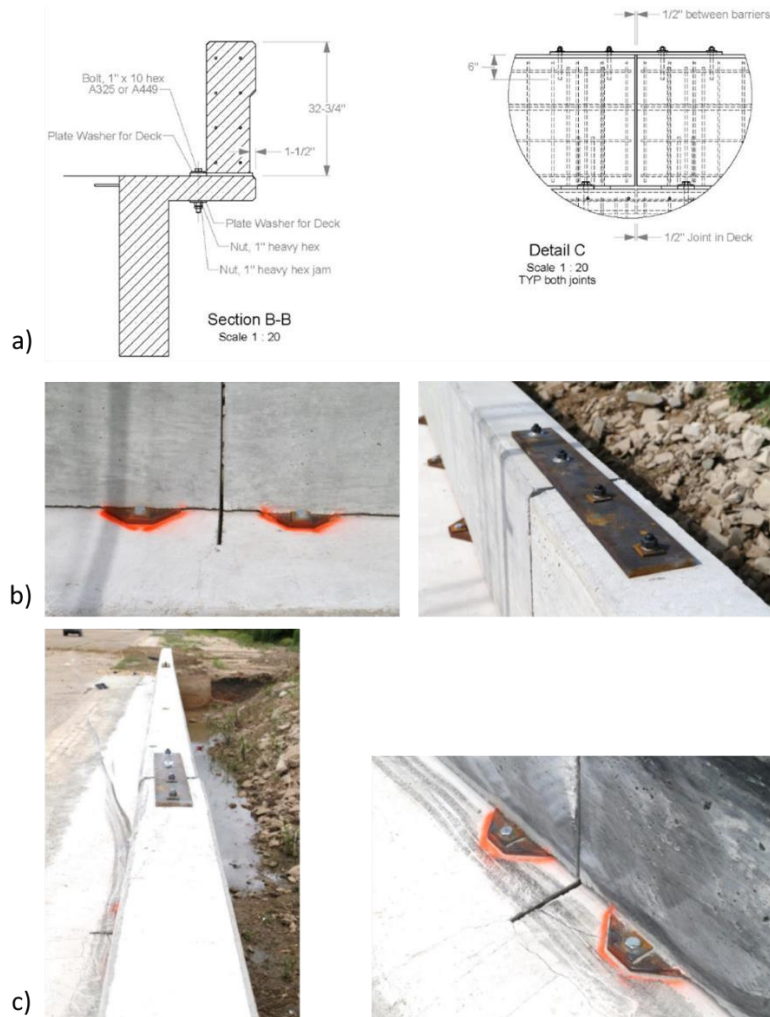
Research at TTI on the TxDOT T222 bridge rail: a) Details of the bridge rail, b) Close view of the constructed specimen at impact point, and c) damage in the barrier system after the impact [11].
